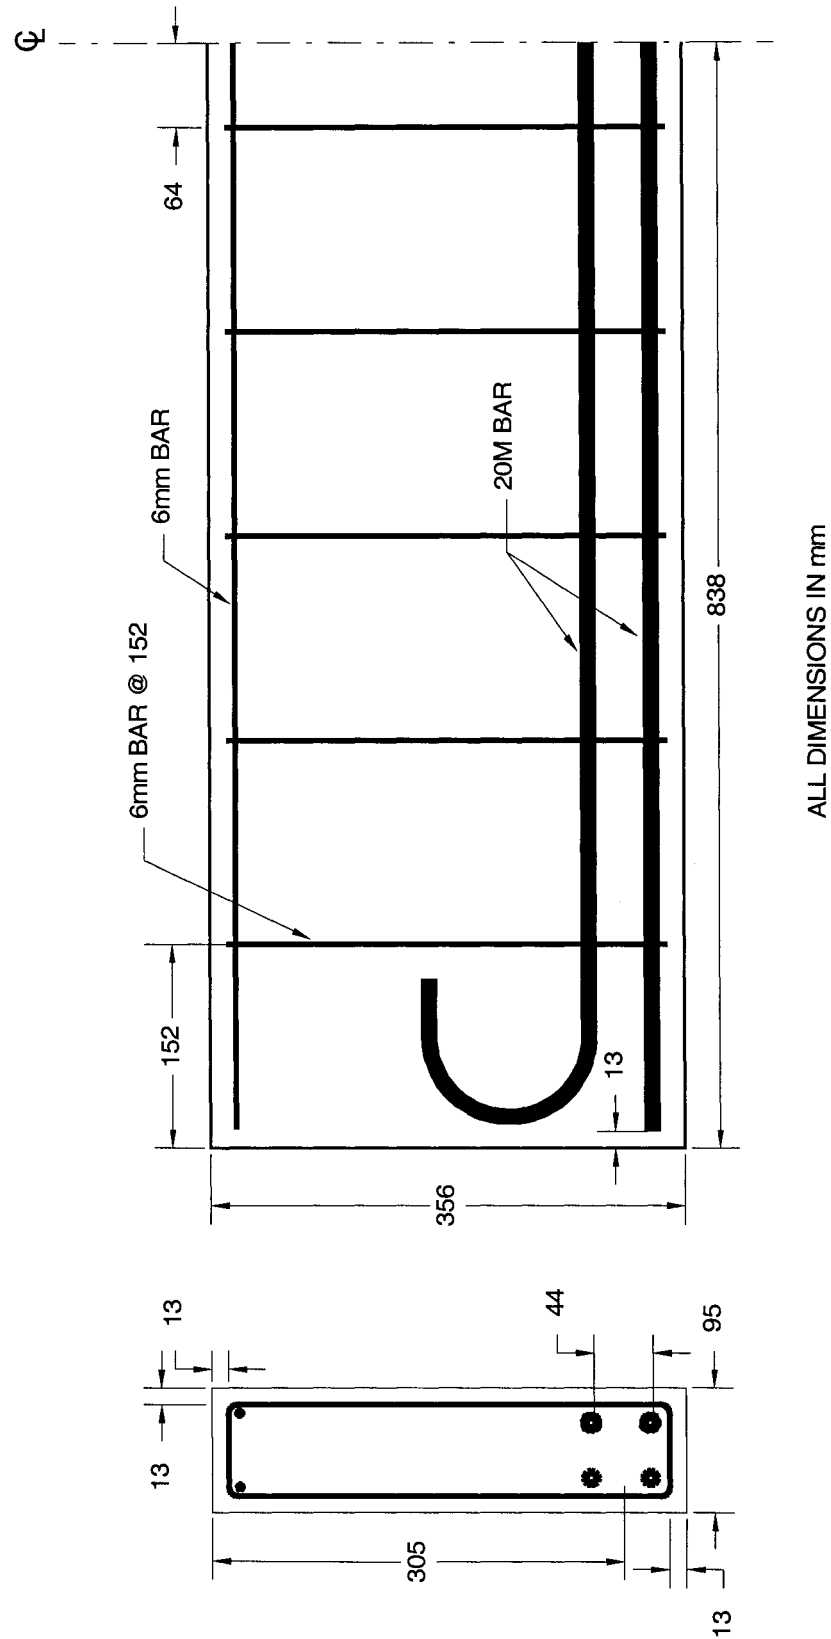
Reinforcement details for test beams B150S6, B250S6 and B350S6.
